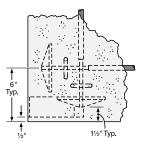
When installed on a raised curb, use Stemwall installation and loads (see pages 29-31)
